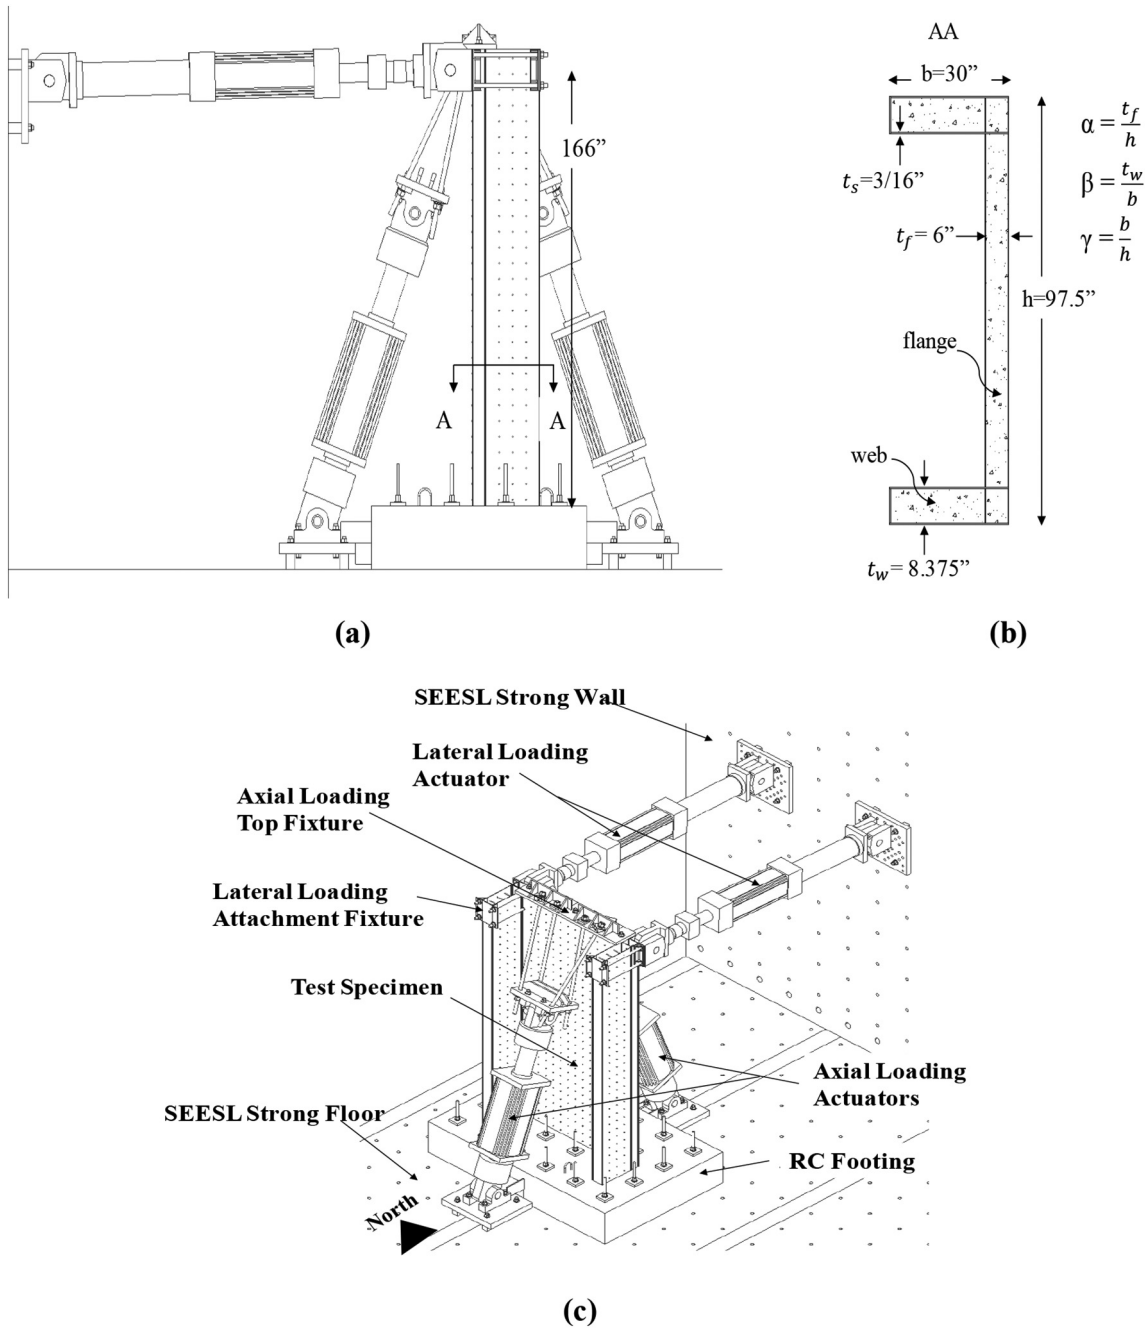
Details of C-Shaped walls in (a) elevation view and (b) plan view and (c) total test setup (Note: 1 in. = 25.4 mm).
